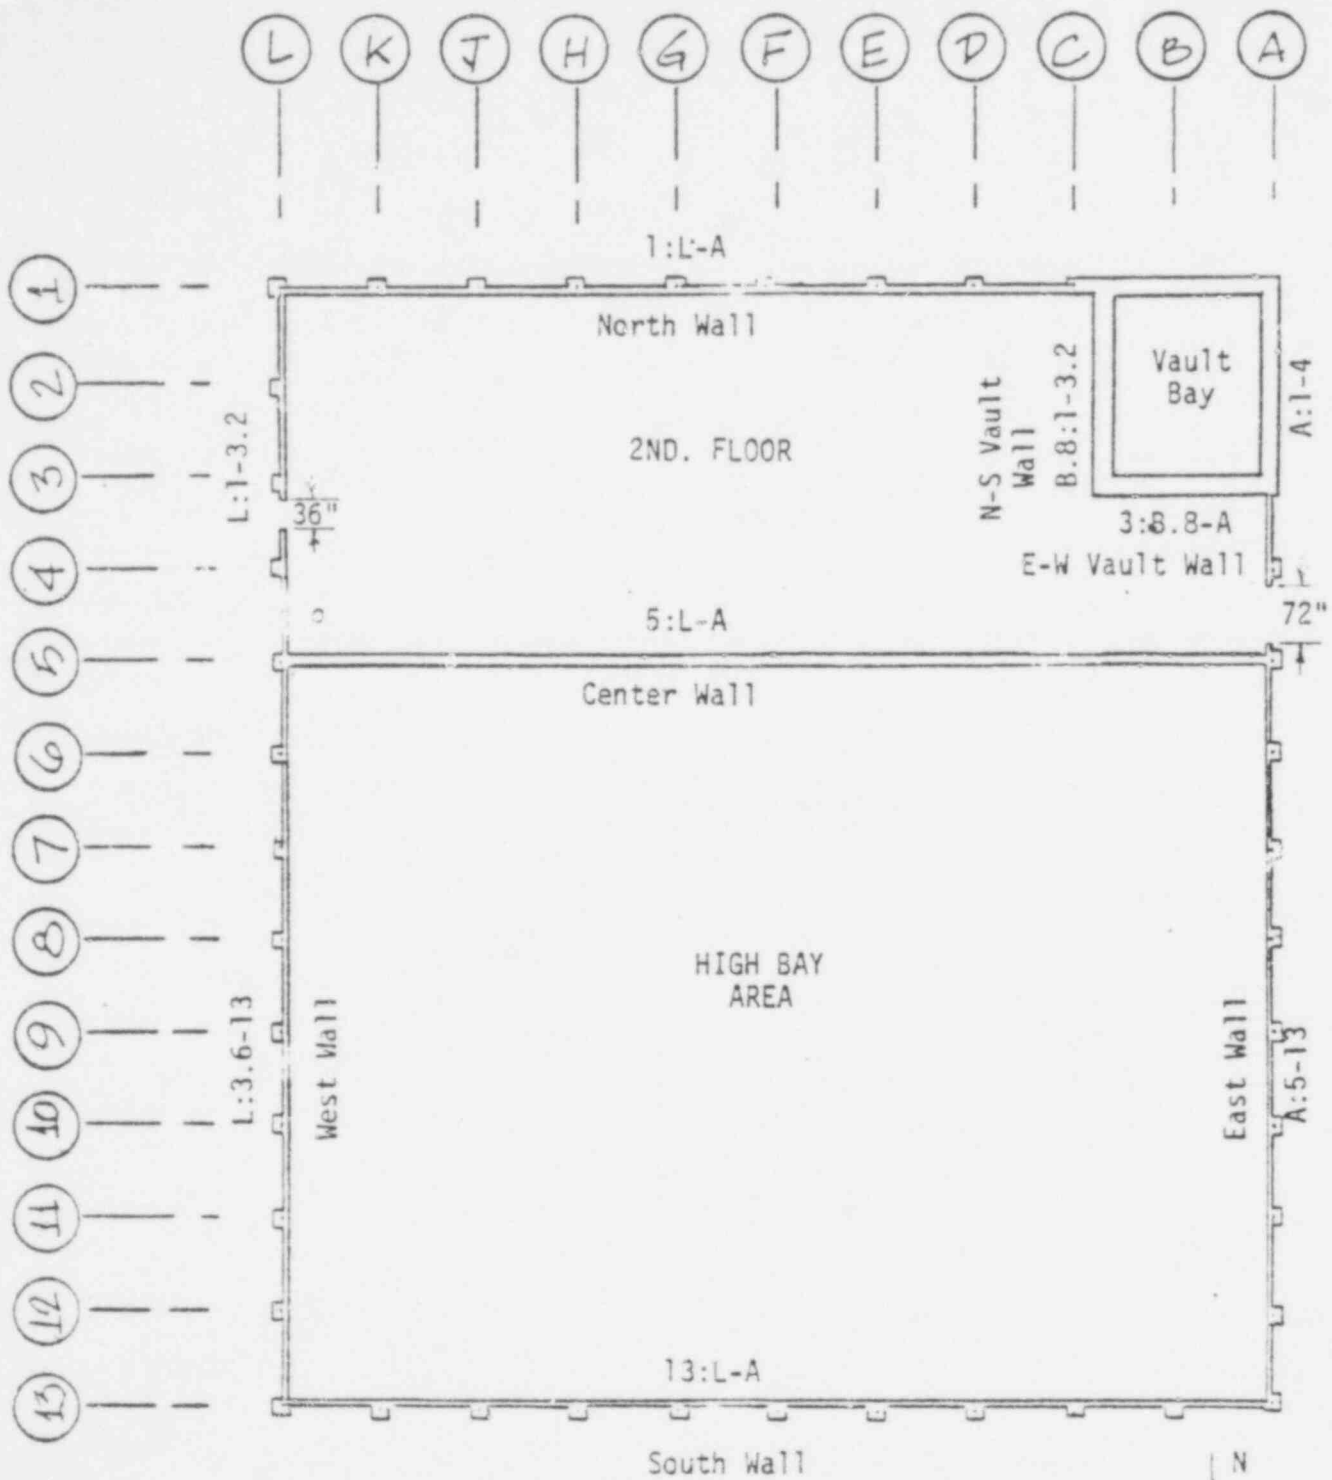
(b) 2nd. STORY STRUCTURAL WALL ELEMENTS
